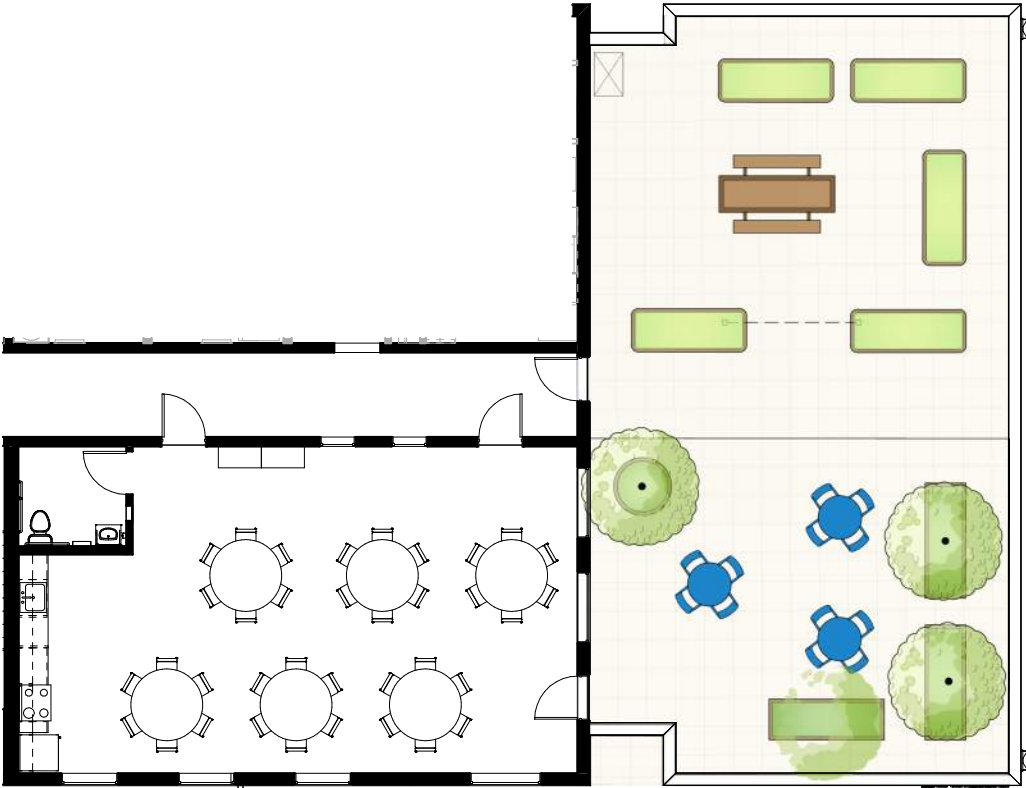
Level 6 Common Room & Roof Terrace Plan
